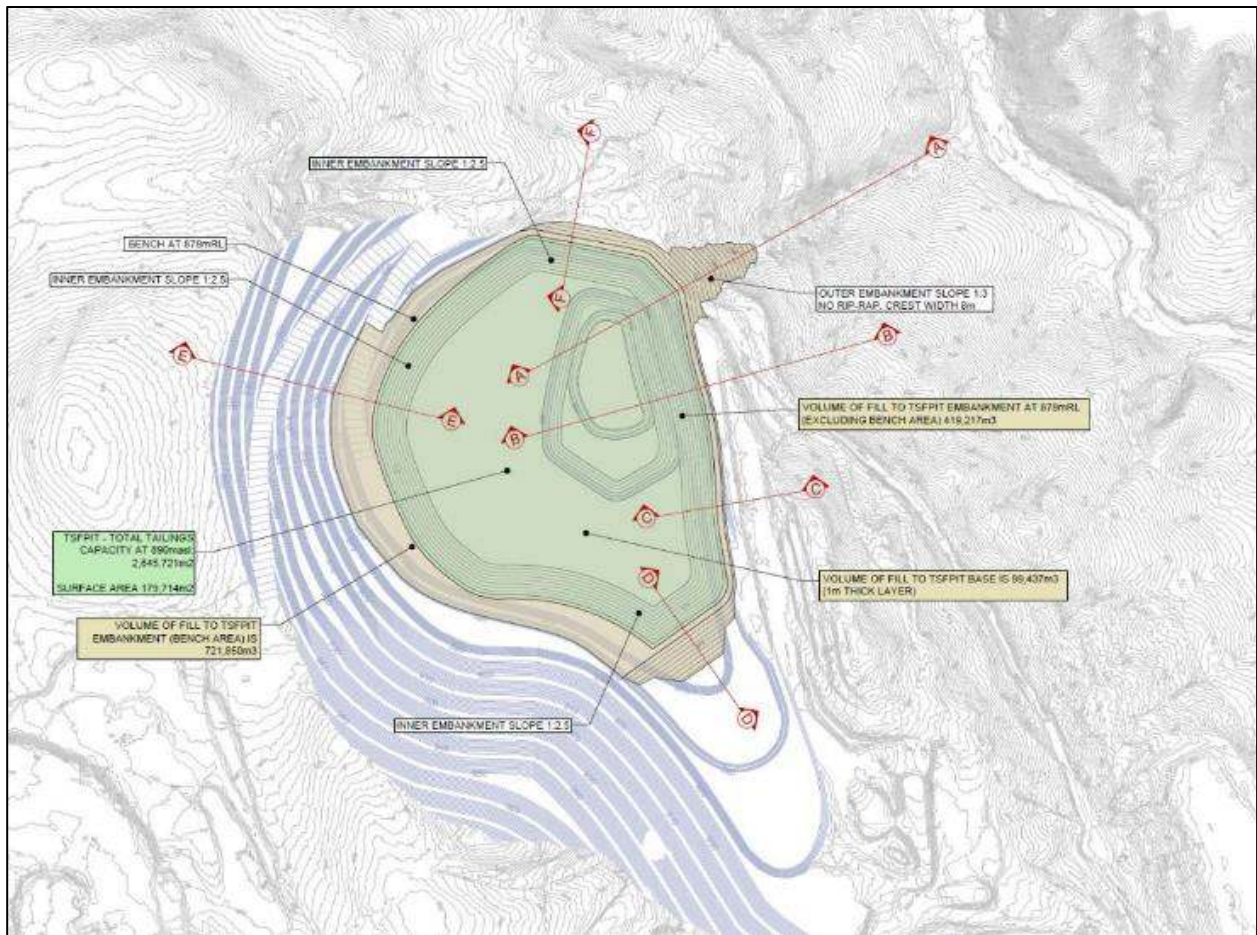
TSF-Pit Stage1 Configuration Plan (Elevation 878mRL)
